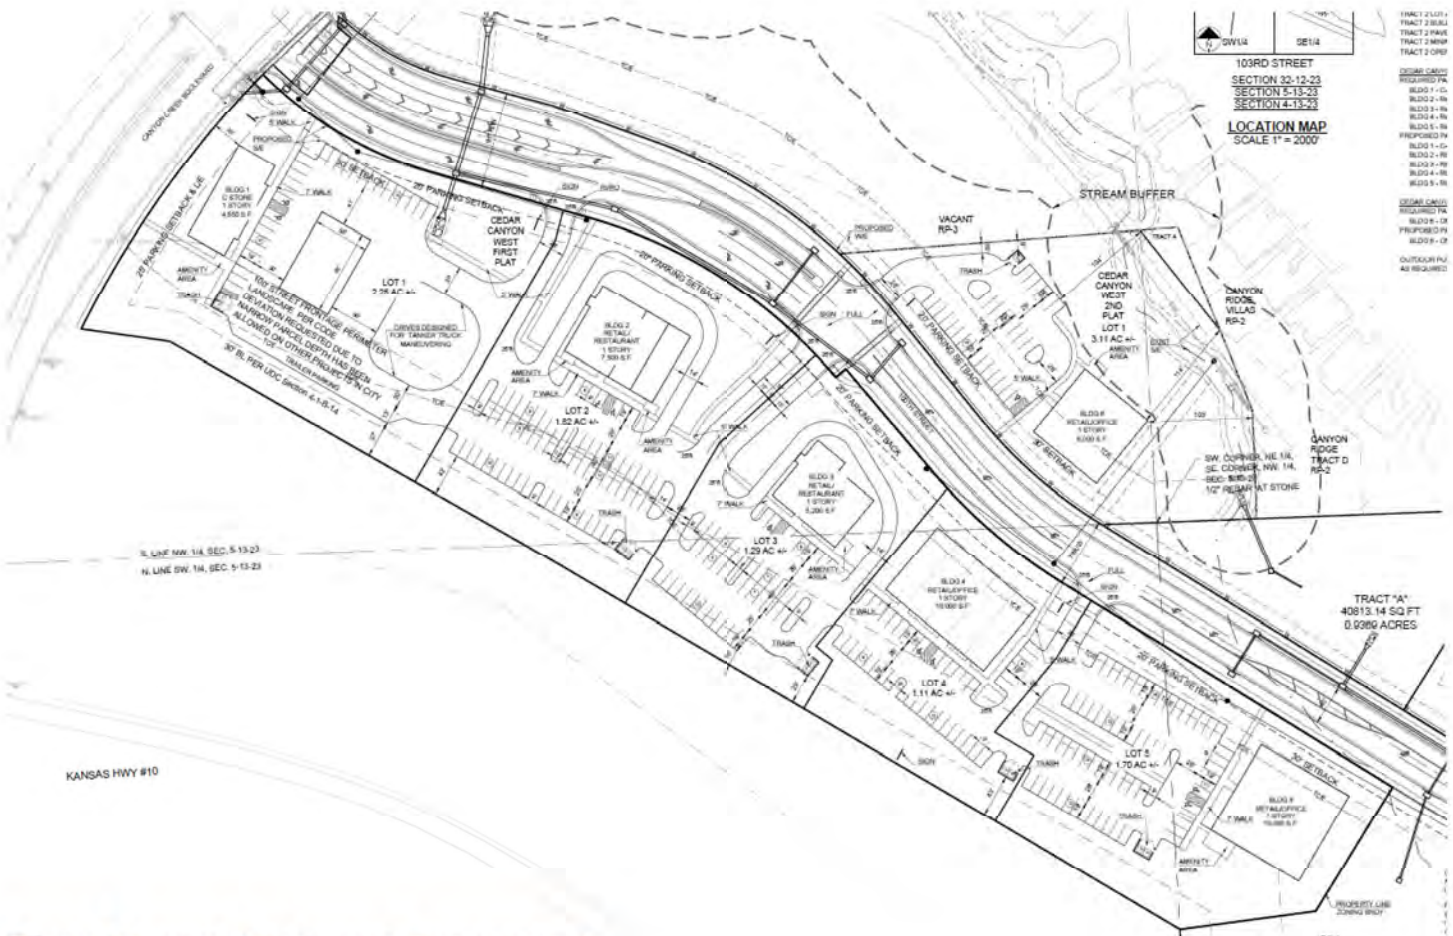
Excerpt of the Proposed Preliminary Plan.
